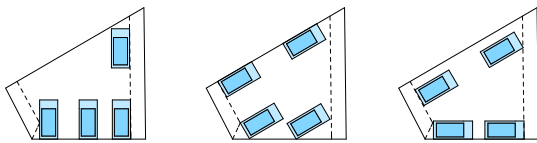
| Site configuration - four towers - Eight dwellings - 57dph
